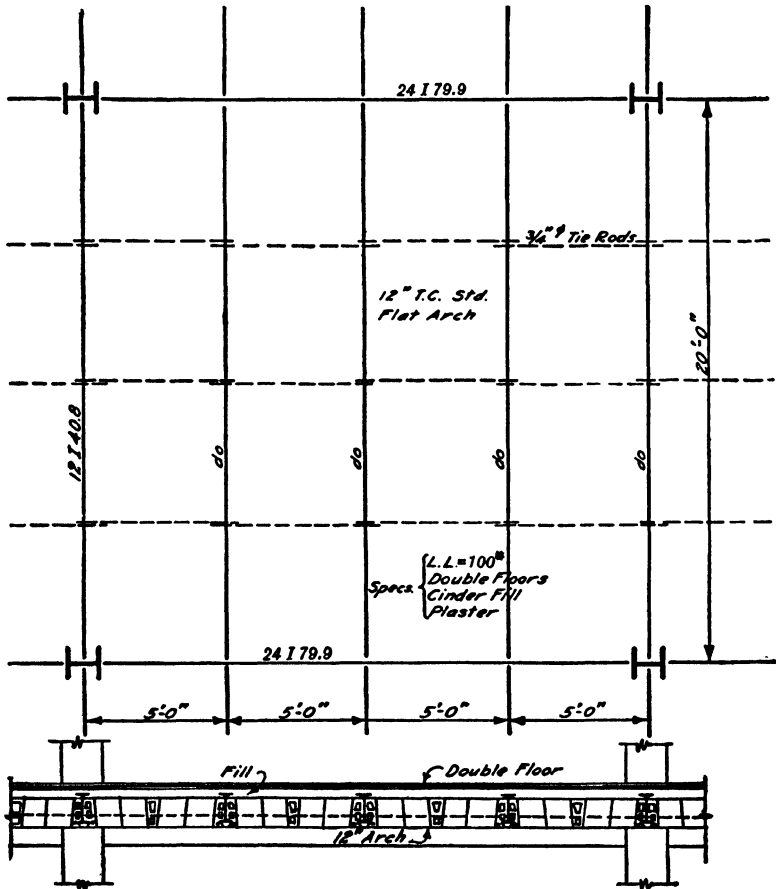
Framing for Terra Cotta Floor Arches.
